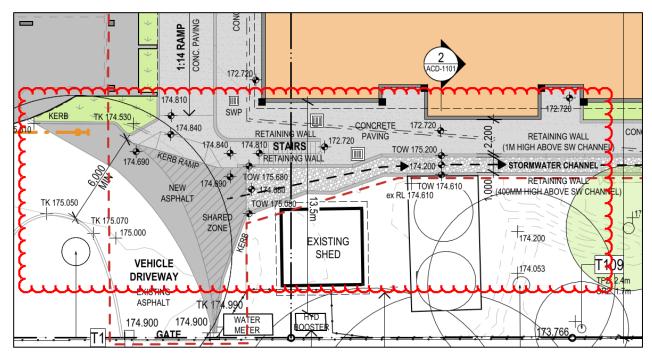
Revised raised driveway, entry / ramp level and flood channel
